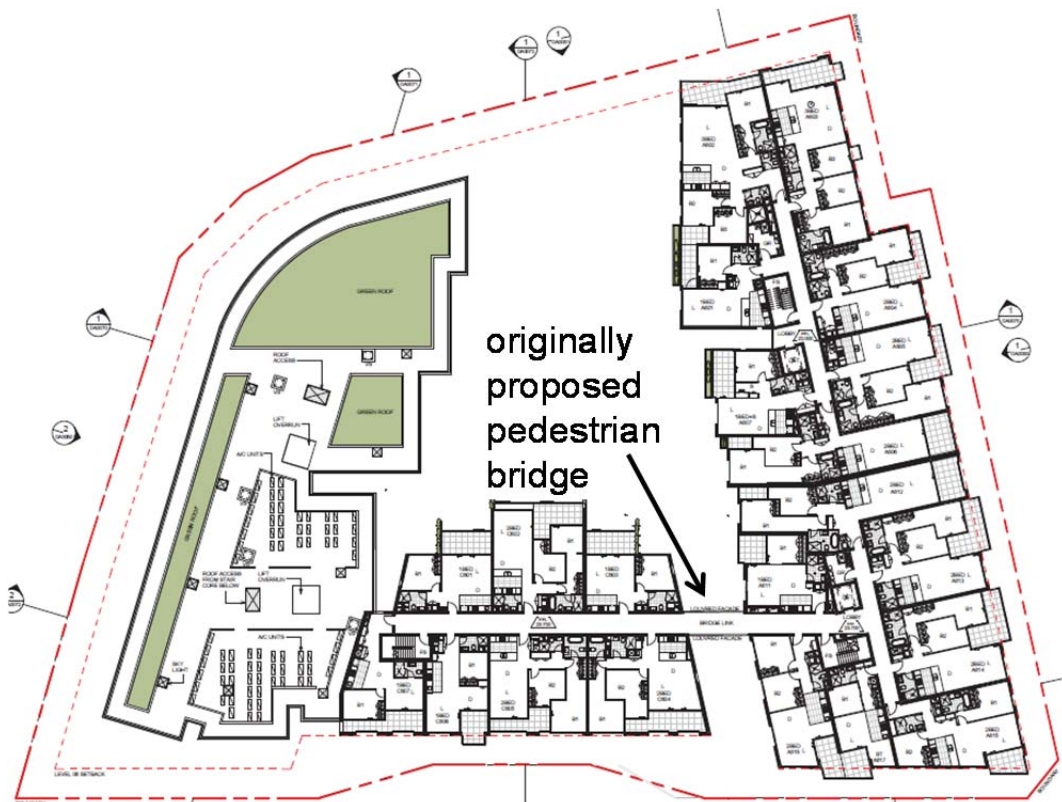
Original proposal including pedestrian bridge link between 5A and 5B at Levels 3-8
